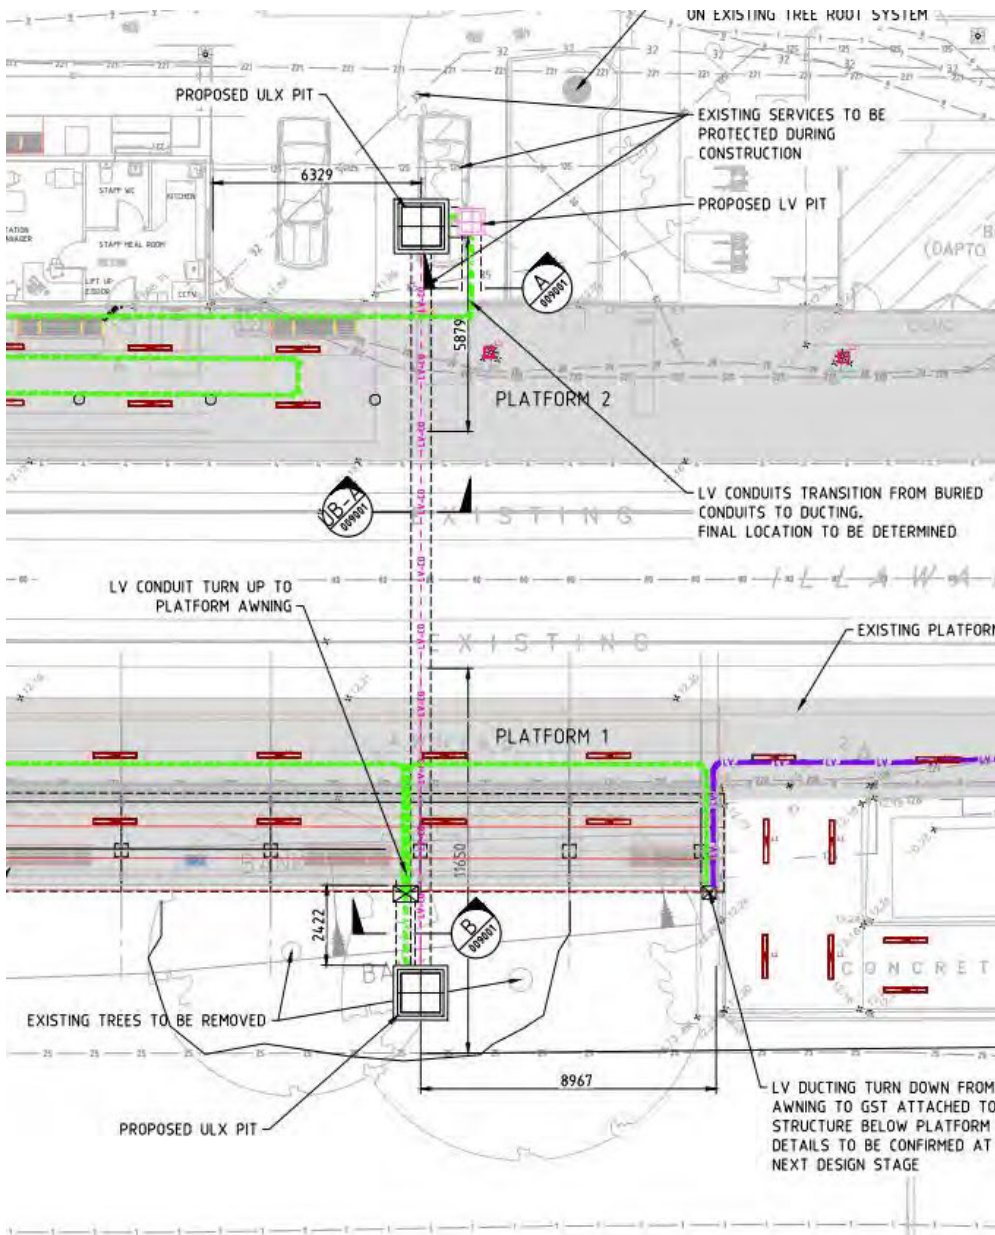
Excerpt from plan services plan. Source: TfNSW
